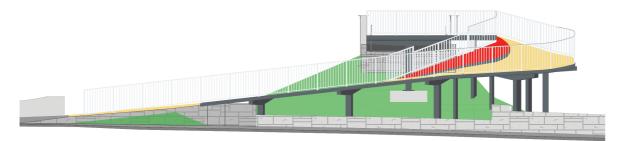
Artistic Impression of Proposed Ramp (View from The Ride)
